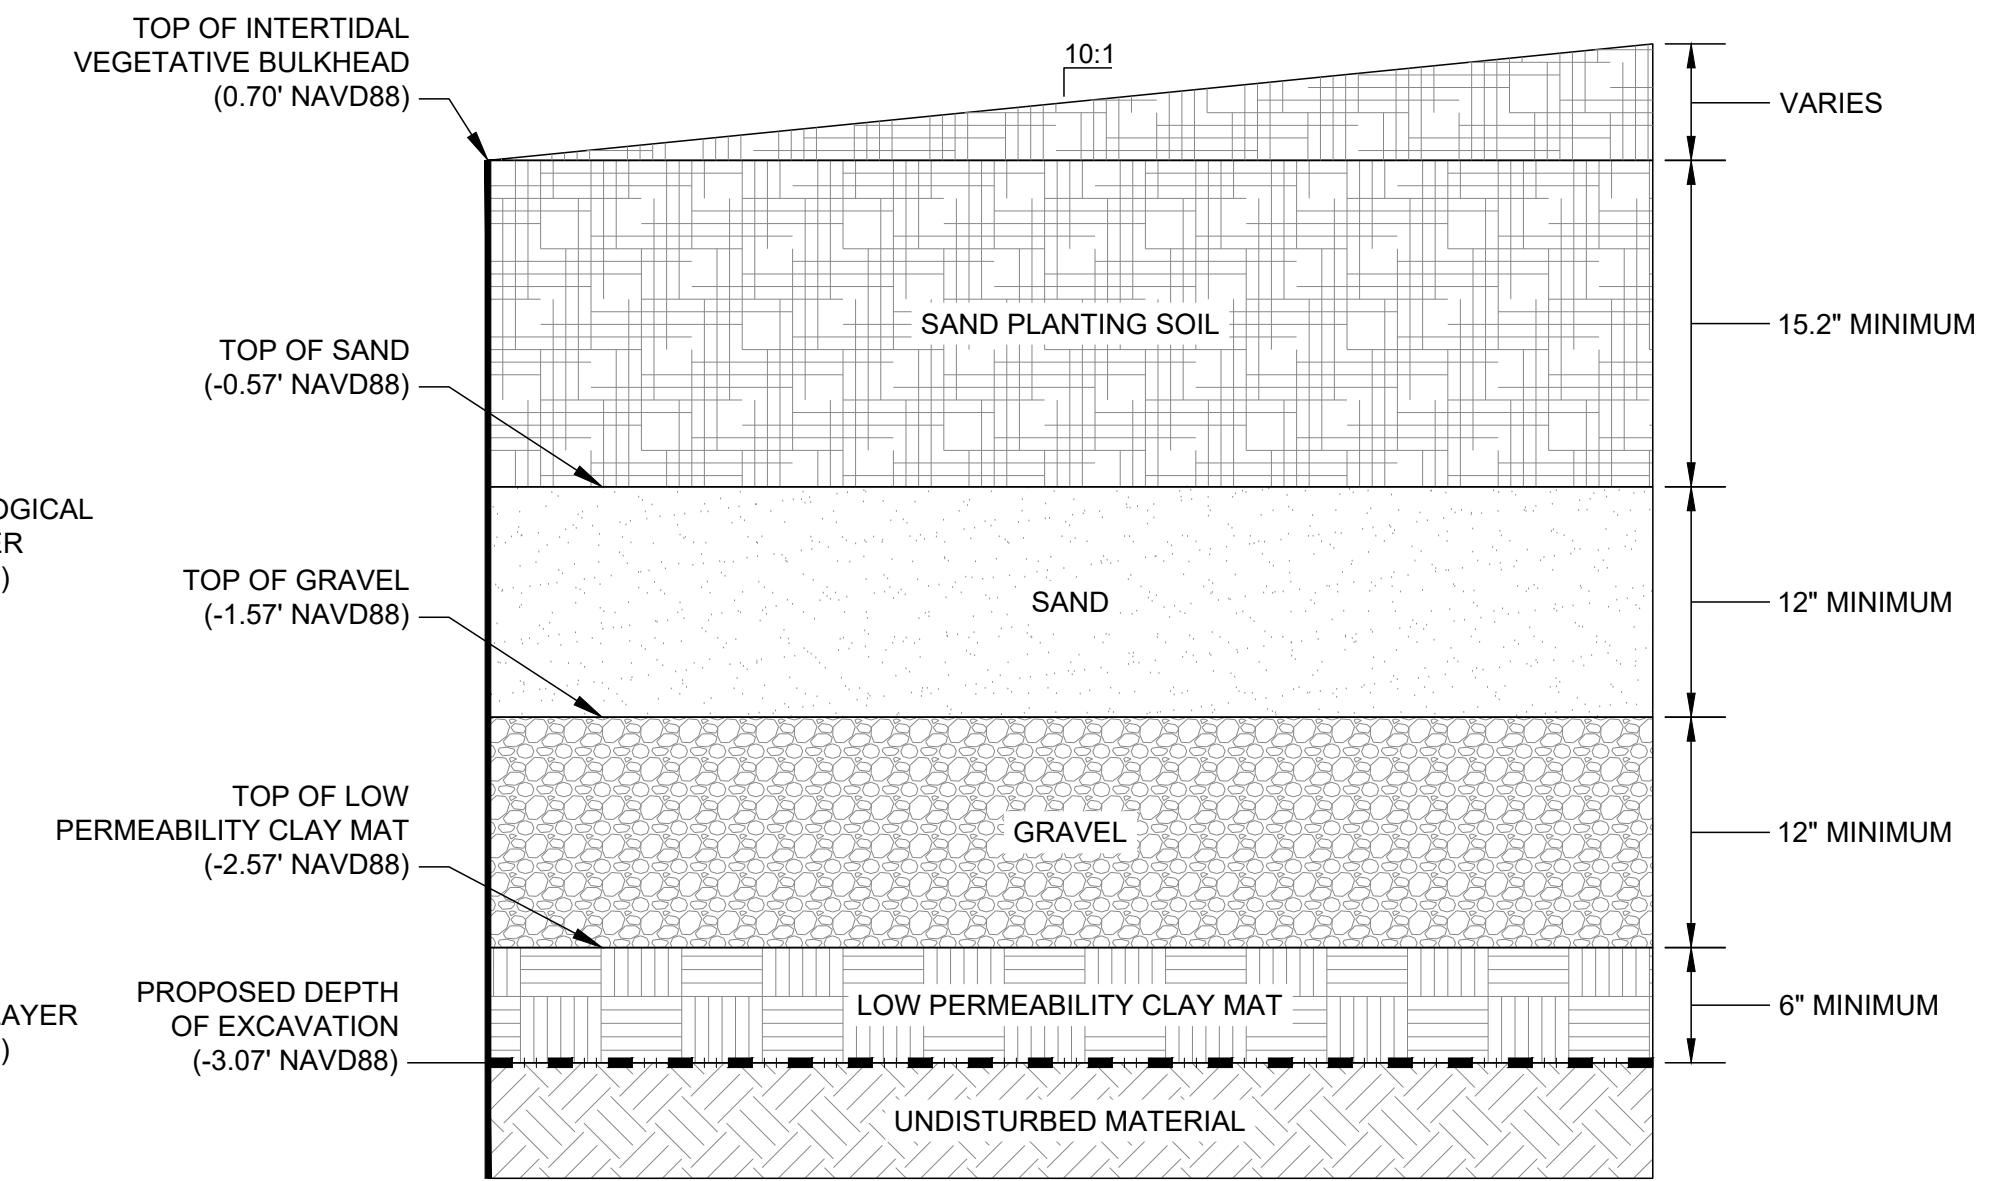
TYPICAL SEDIMENT CAP CROSS SECTION (TYPE 2 AND 3)
